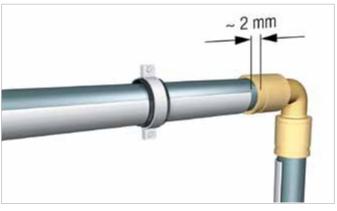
Let the pipe support channel end approx. 2 mm before compression sleeve
